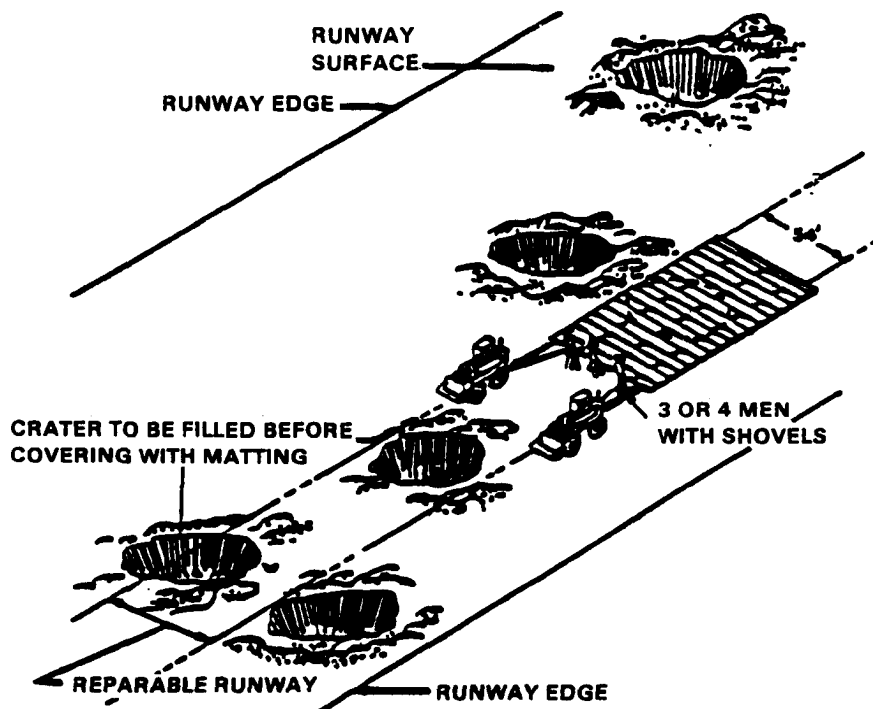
PATCH ASSEMBLY - METHOD B
